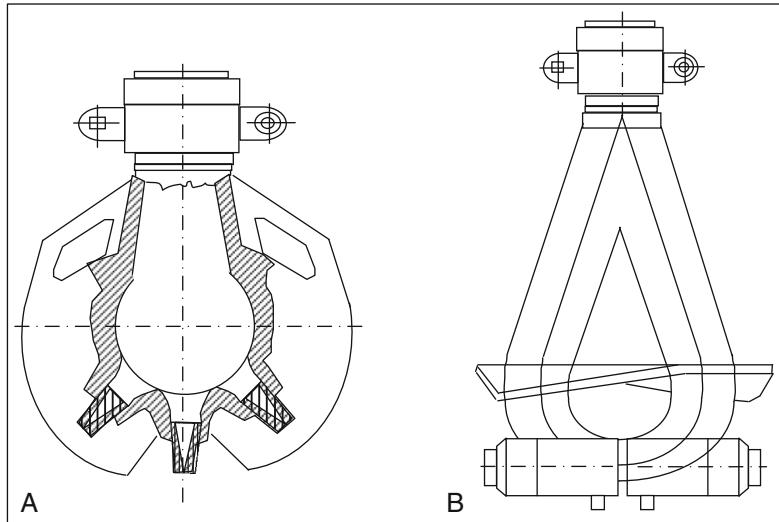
(A) Mechanical first boring tool. (B) Final hydraulic tool
